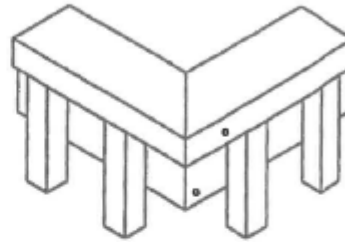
Exterior Connection: Infill Picket Screwed to Rail
